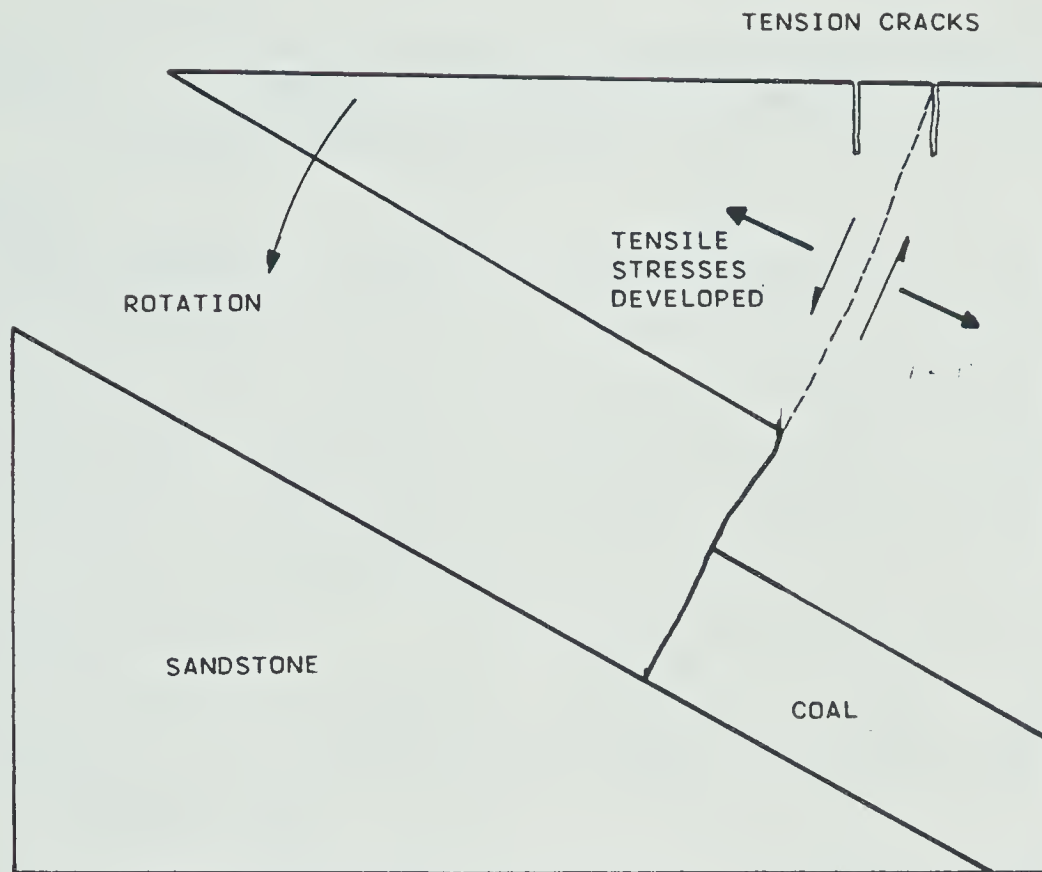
HANGING WALL FAILURE MECHANISM
